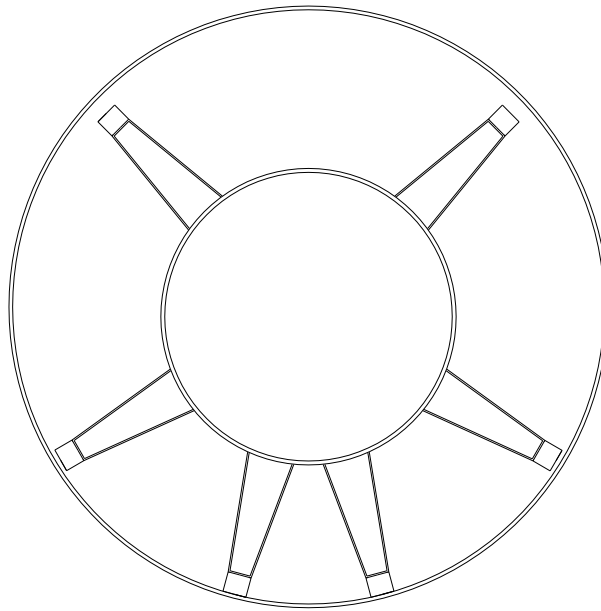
Cross-sectional View of Casing and Carrier Pipes with Spacers/Isolators
